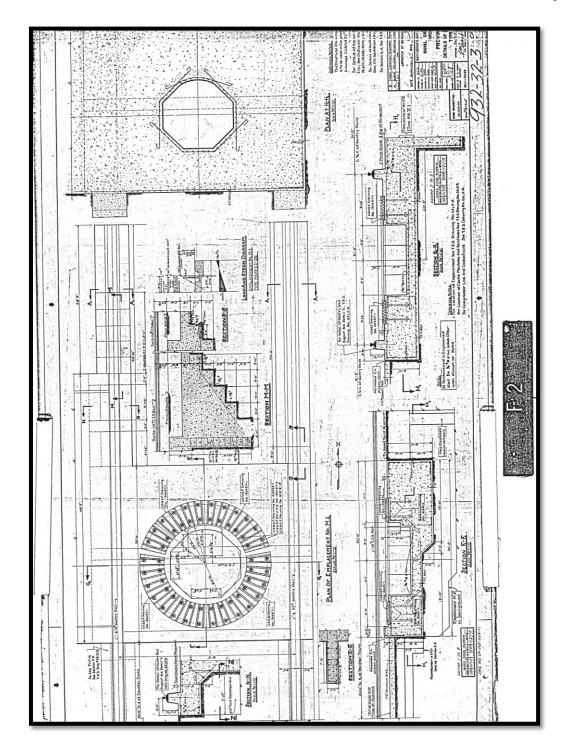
INL drawing number 11211802 (CF-102-USN-15); proof / gun emplacement area, details of emplacement no. M-1, type marked VII; frame 2 of 2; September 1942.
